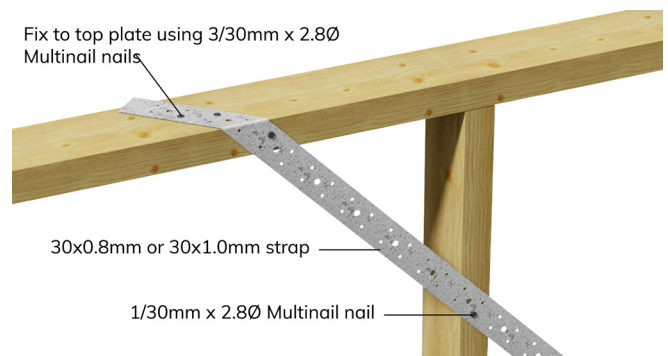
Nails to the top of the top plate - for 1.5kN/m bracing wall
